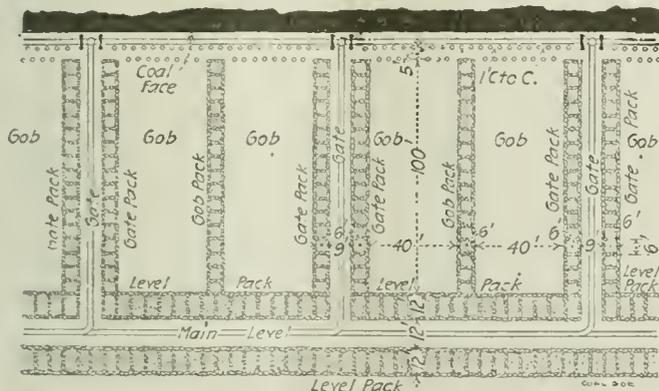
SHOWING GATEROADS LEADING TO LONGWALL FACE
